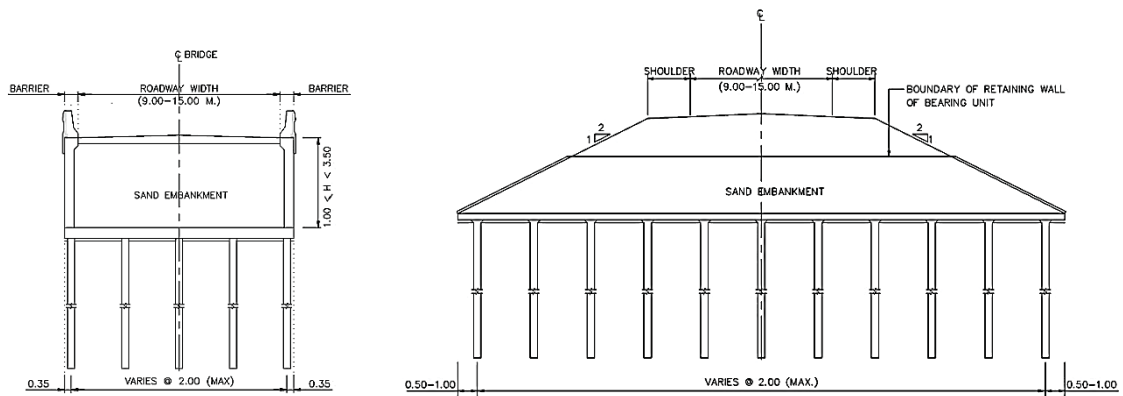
BEARING UNIT WITH AND WITHOUT RETAINING WALL
